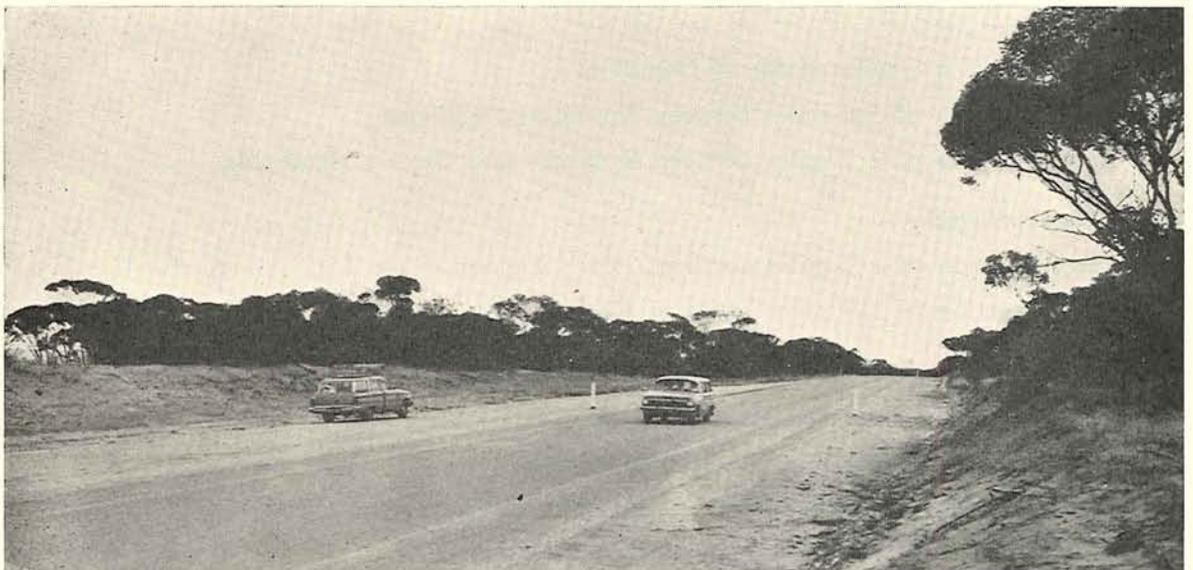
Ouyen Highway—Reconstruction of 5.3 miles between Boinka and Tutye.
